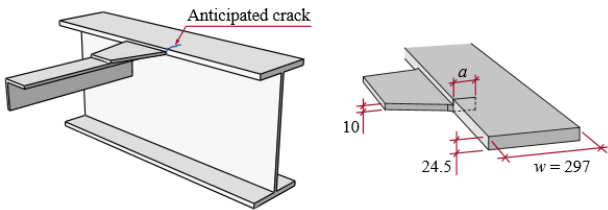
Dimensions and crack configurations of the gusset plate.
